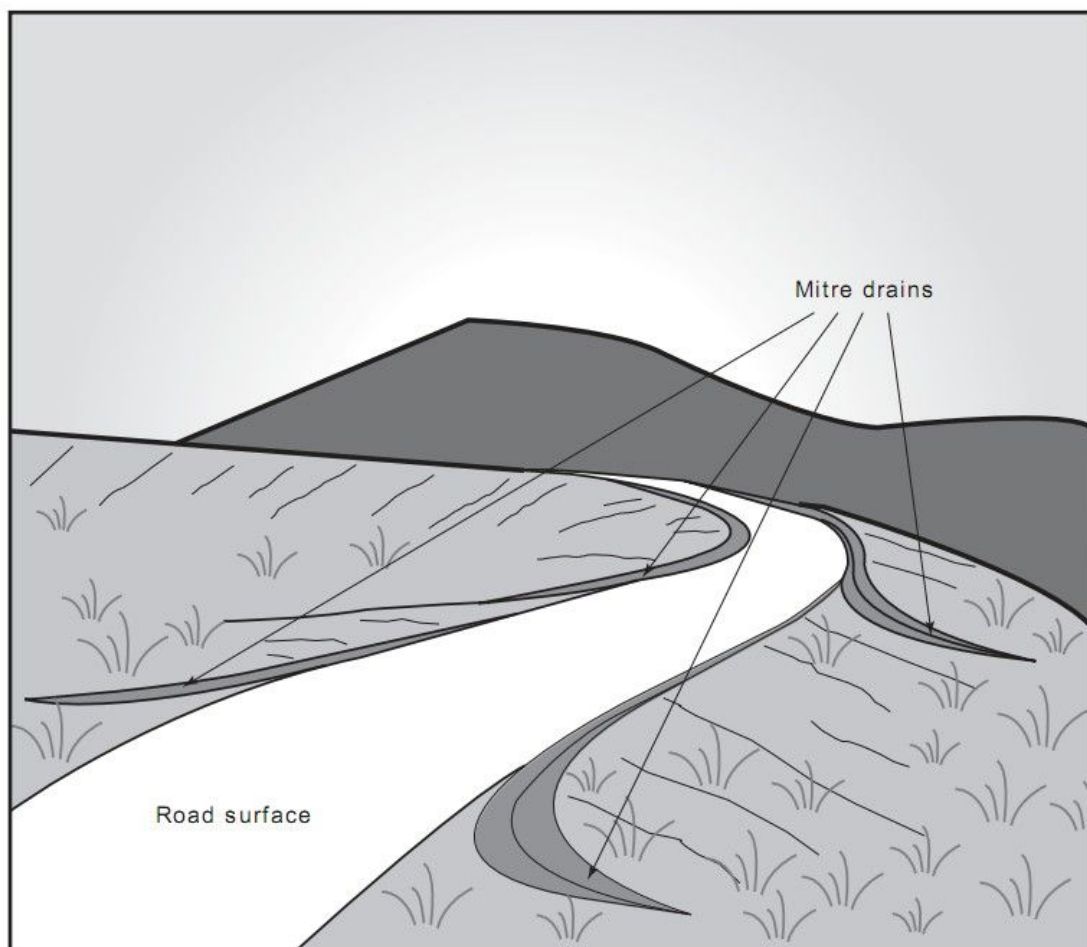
Mitre Drains to Control Road Drainage (DECC, 2008a)
